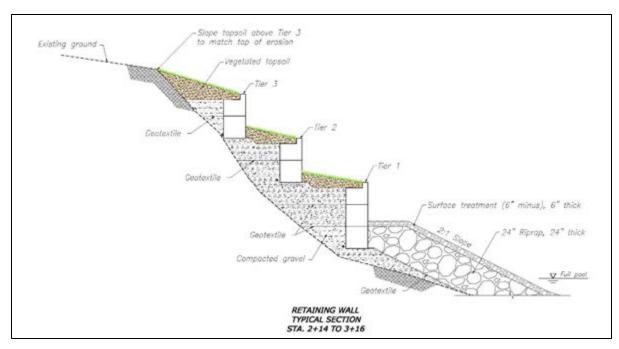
Cross-section drawing of the three-tiered retaining wall at the southern portion of the stabilization site
